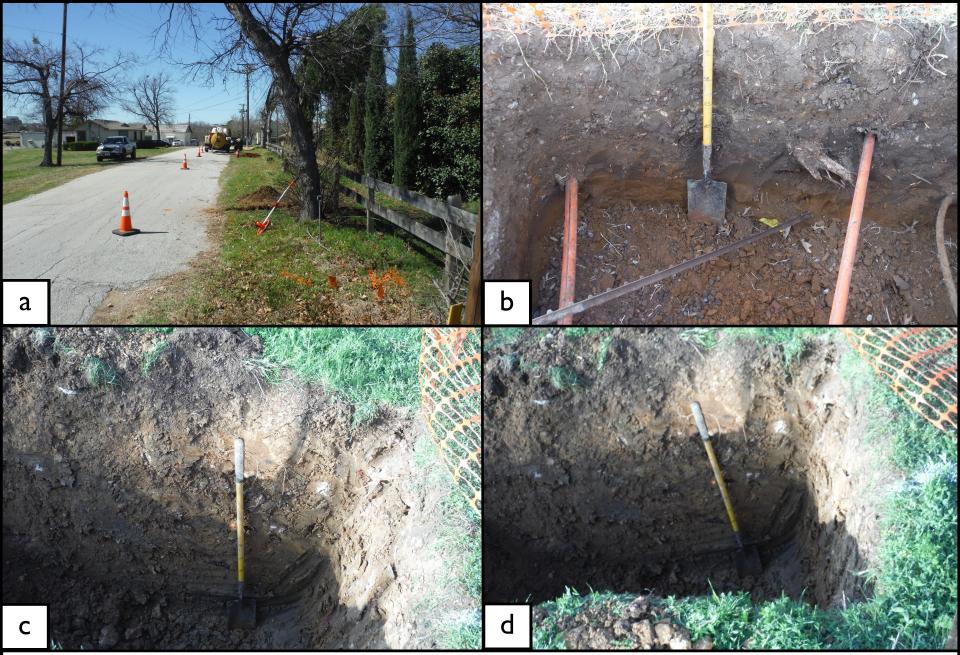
ML-2 from Church and Hudgins streets, view west (a); south wall profile of ML-3, view south (b); southwest wall profile of ML-4, view southwest (c); and overview of ML-4, view east (d).
